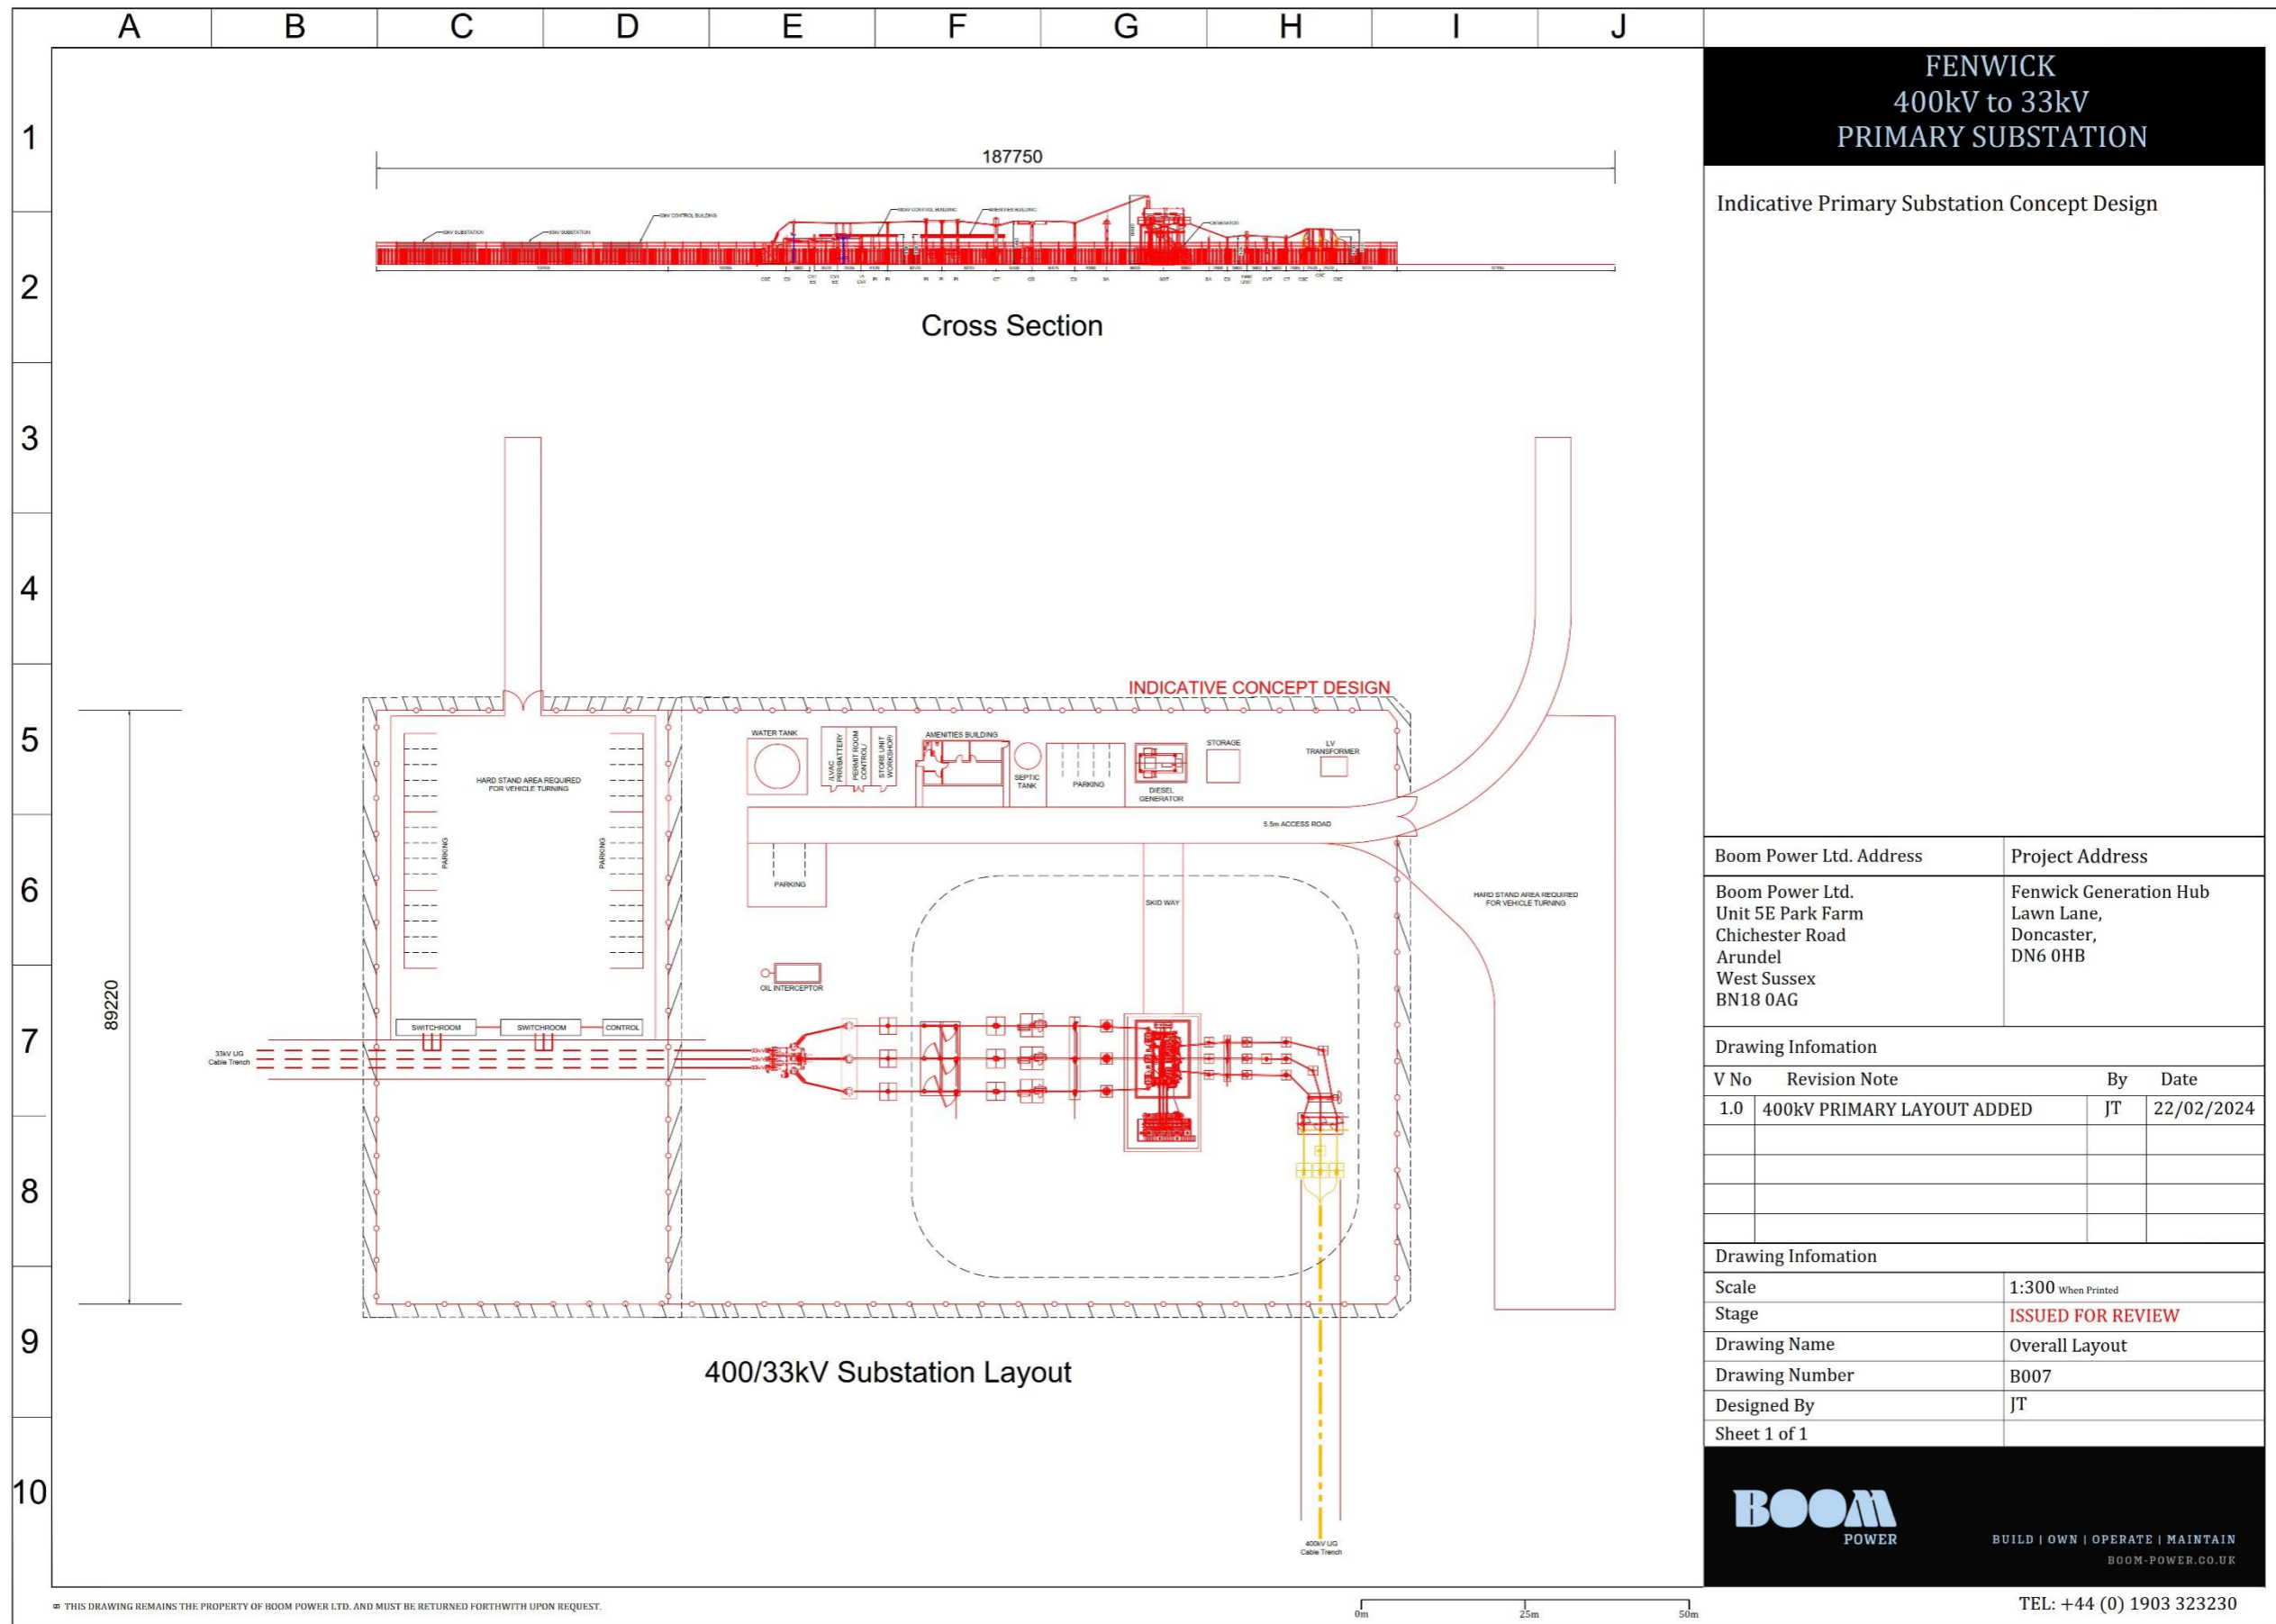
On-Site Substation Elevation and Indicative Layout
